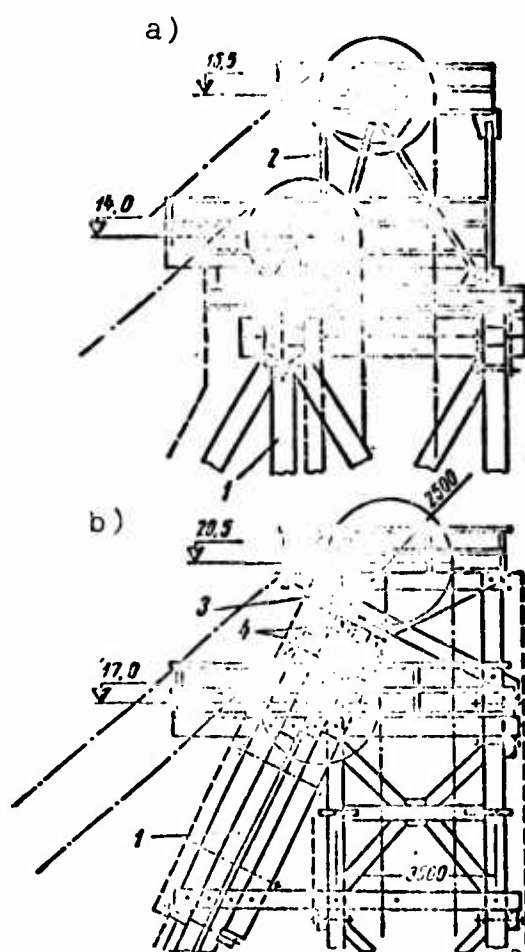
The head of wooden pile drivers with an arrangement of the pulleys in one vertical plane: a) head of a hipped, half-hipped and machine mounted pile driver; b) the head of a diagonal pile driver; 1 - wooden frame of the construction; 2 - coupled metallic trusses with a rigid lower strap; 3 - underpulley trusses; 4 - transverse beams.
